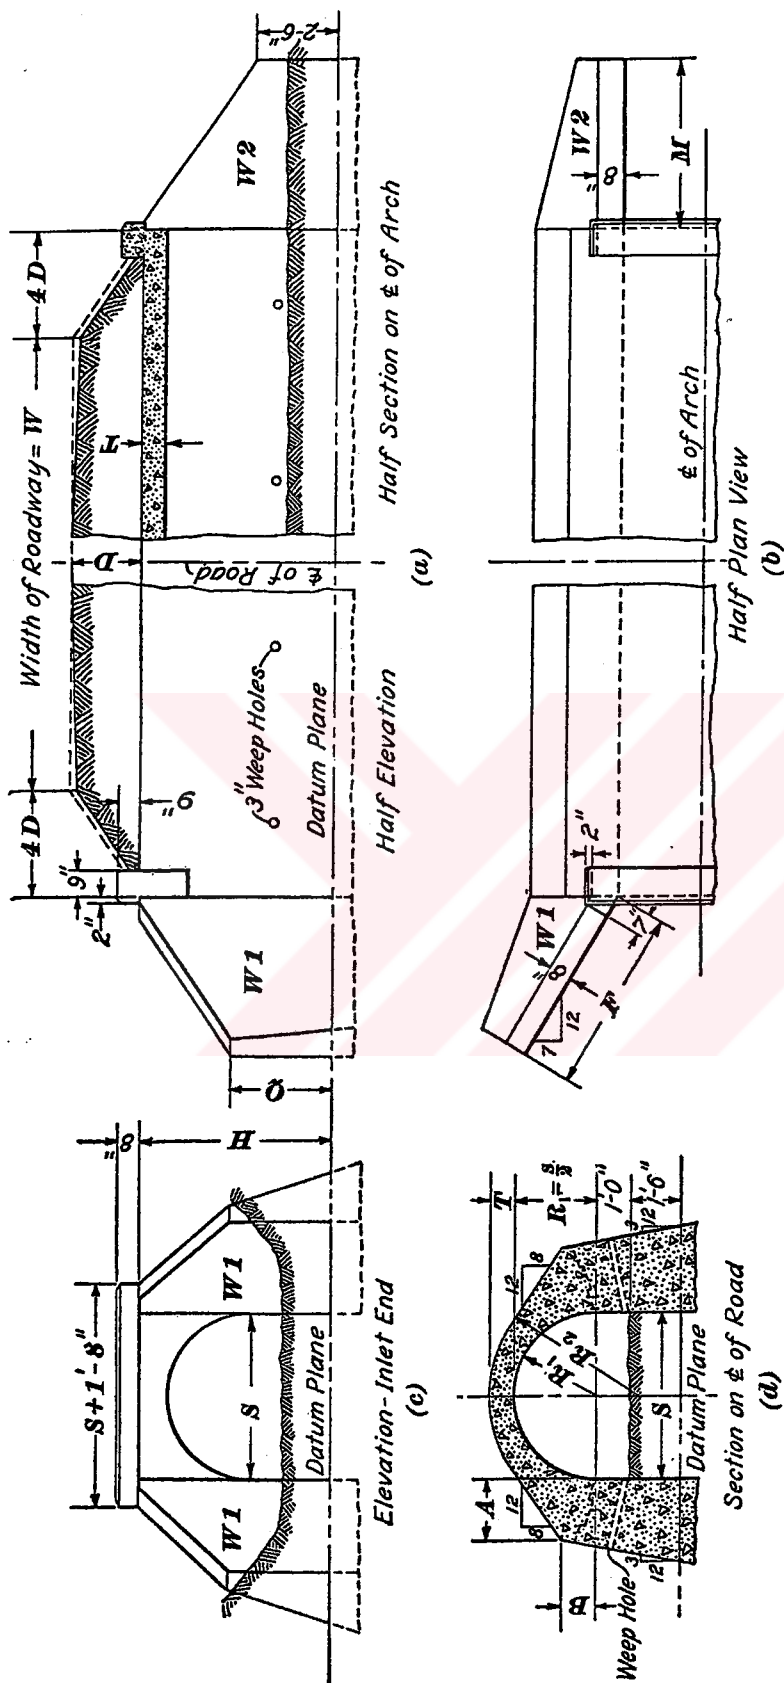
Design for small concrete arch culvert (Bruce & Clarkeson, 1960)
